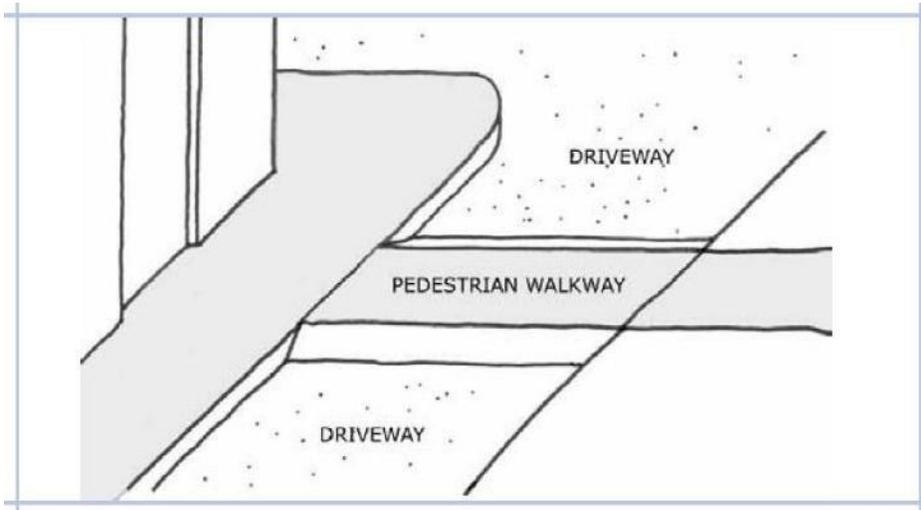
Example of a pedestrian walkway through a drive-through lane. The walkway shall be constructed using distinctive stamped asphalt or concrete.
